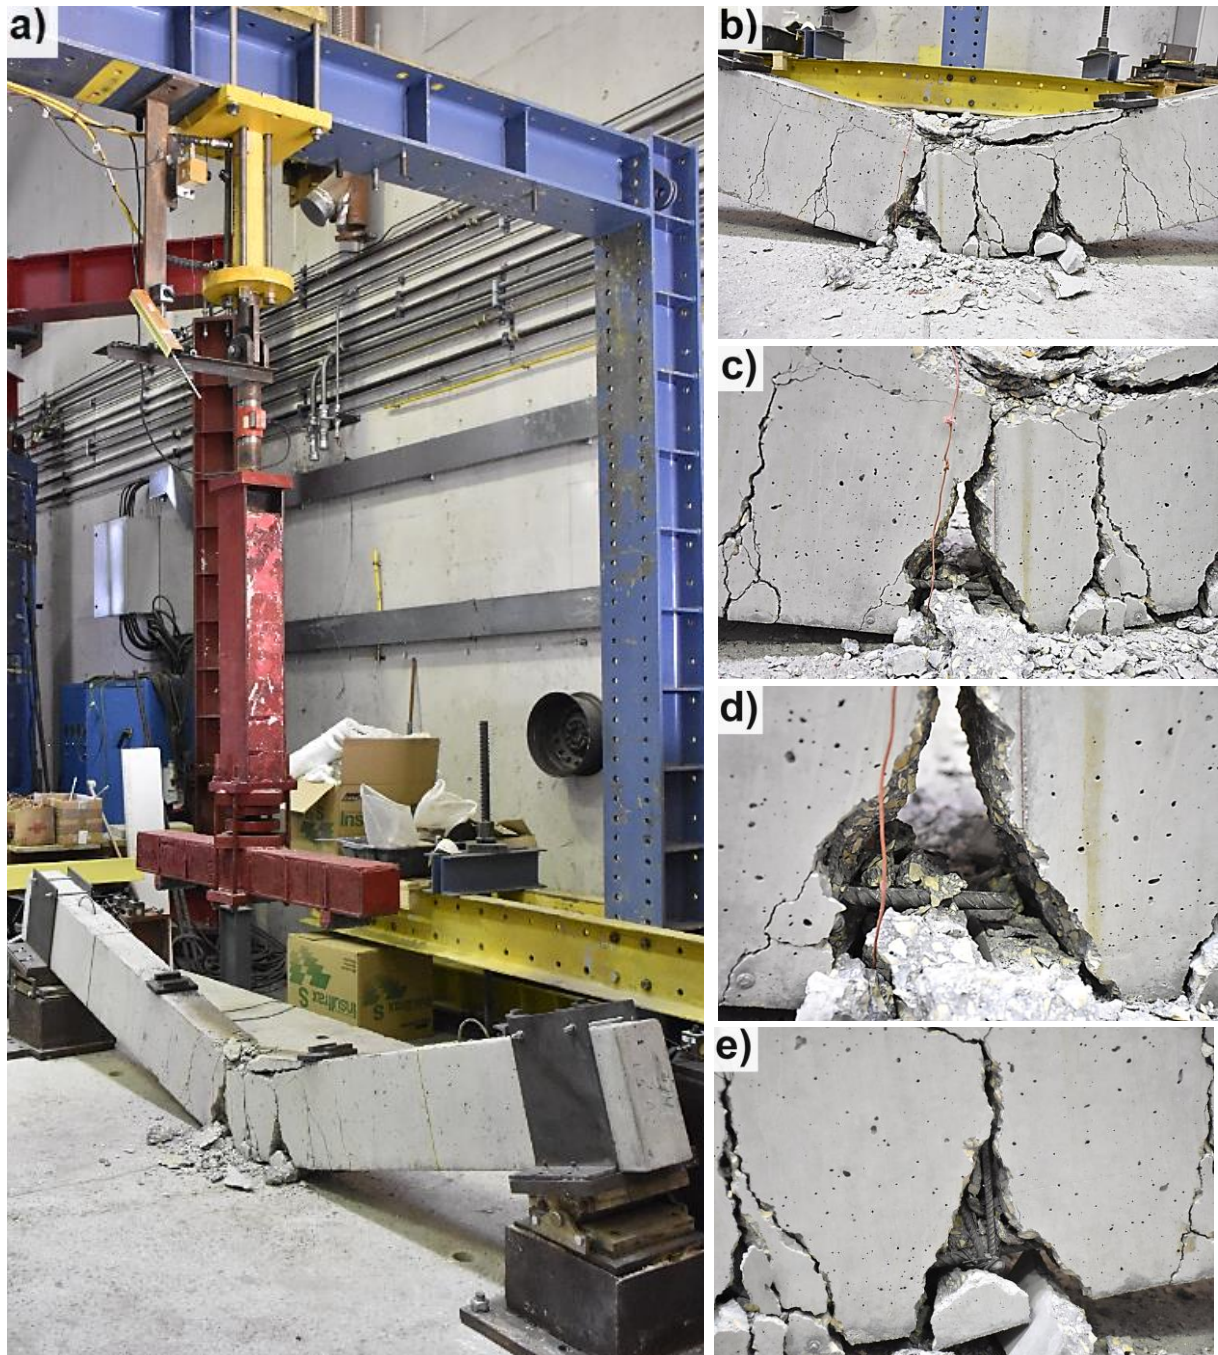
Failure modes of the RC beam tested at ambient temperature: (a) general view, (b) failure zone detail with excessive cracking and loss of concrete cover, (c) longitudinal rebar rupture zone, (d) approximate detail of longitudinal rebar collapsed and (e) detail of stirrups exposed after concrete cover detachment
